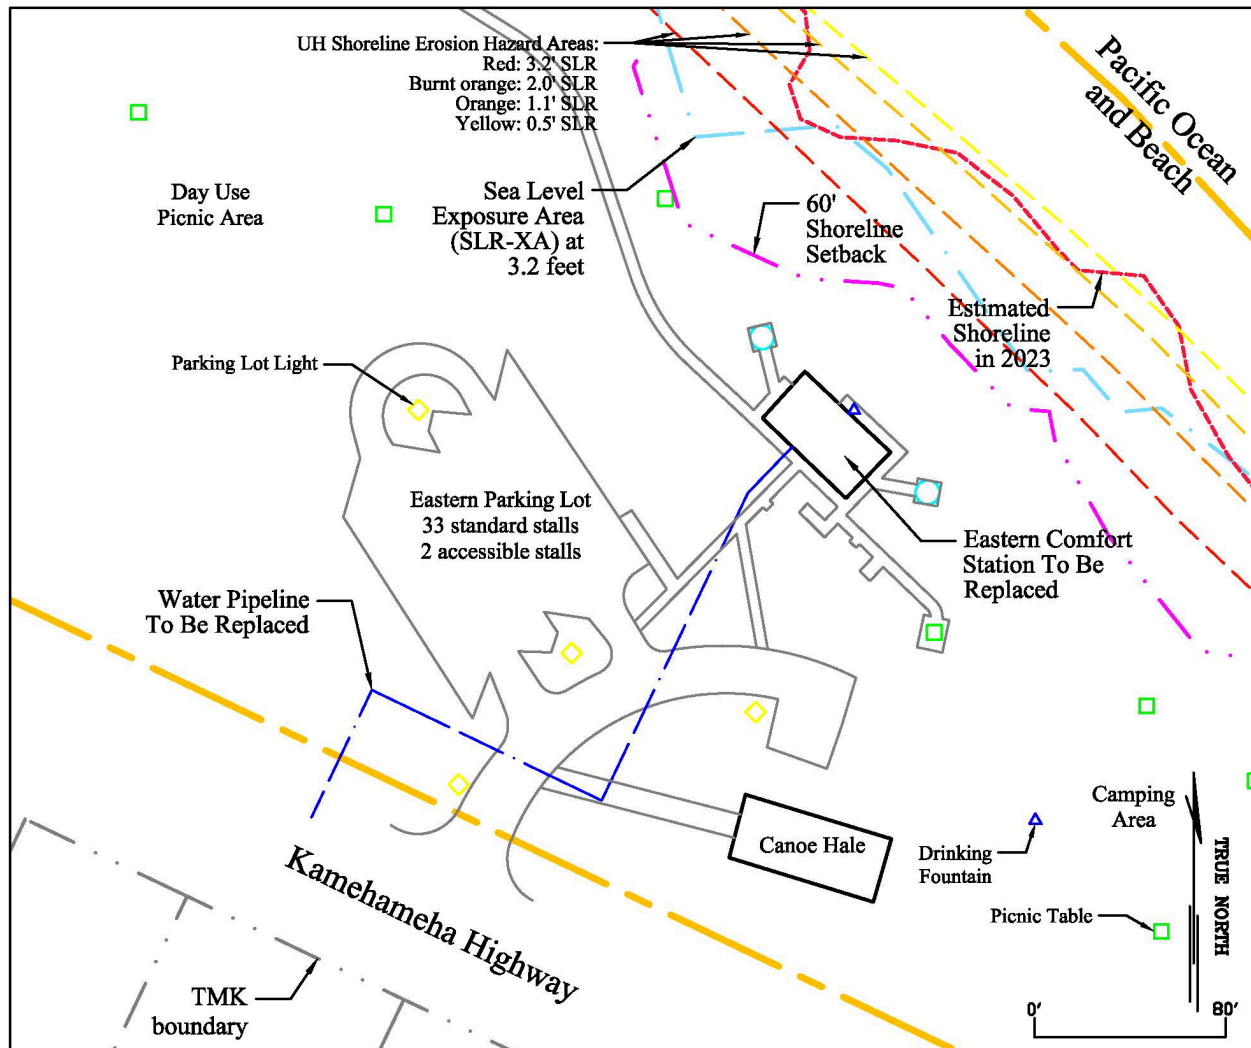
Site Plan, Existing Conditions with 3.2-foot Sea Level Rise Exposure Area
